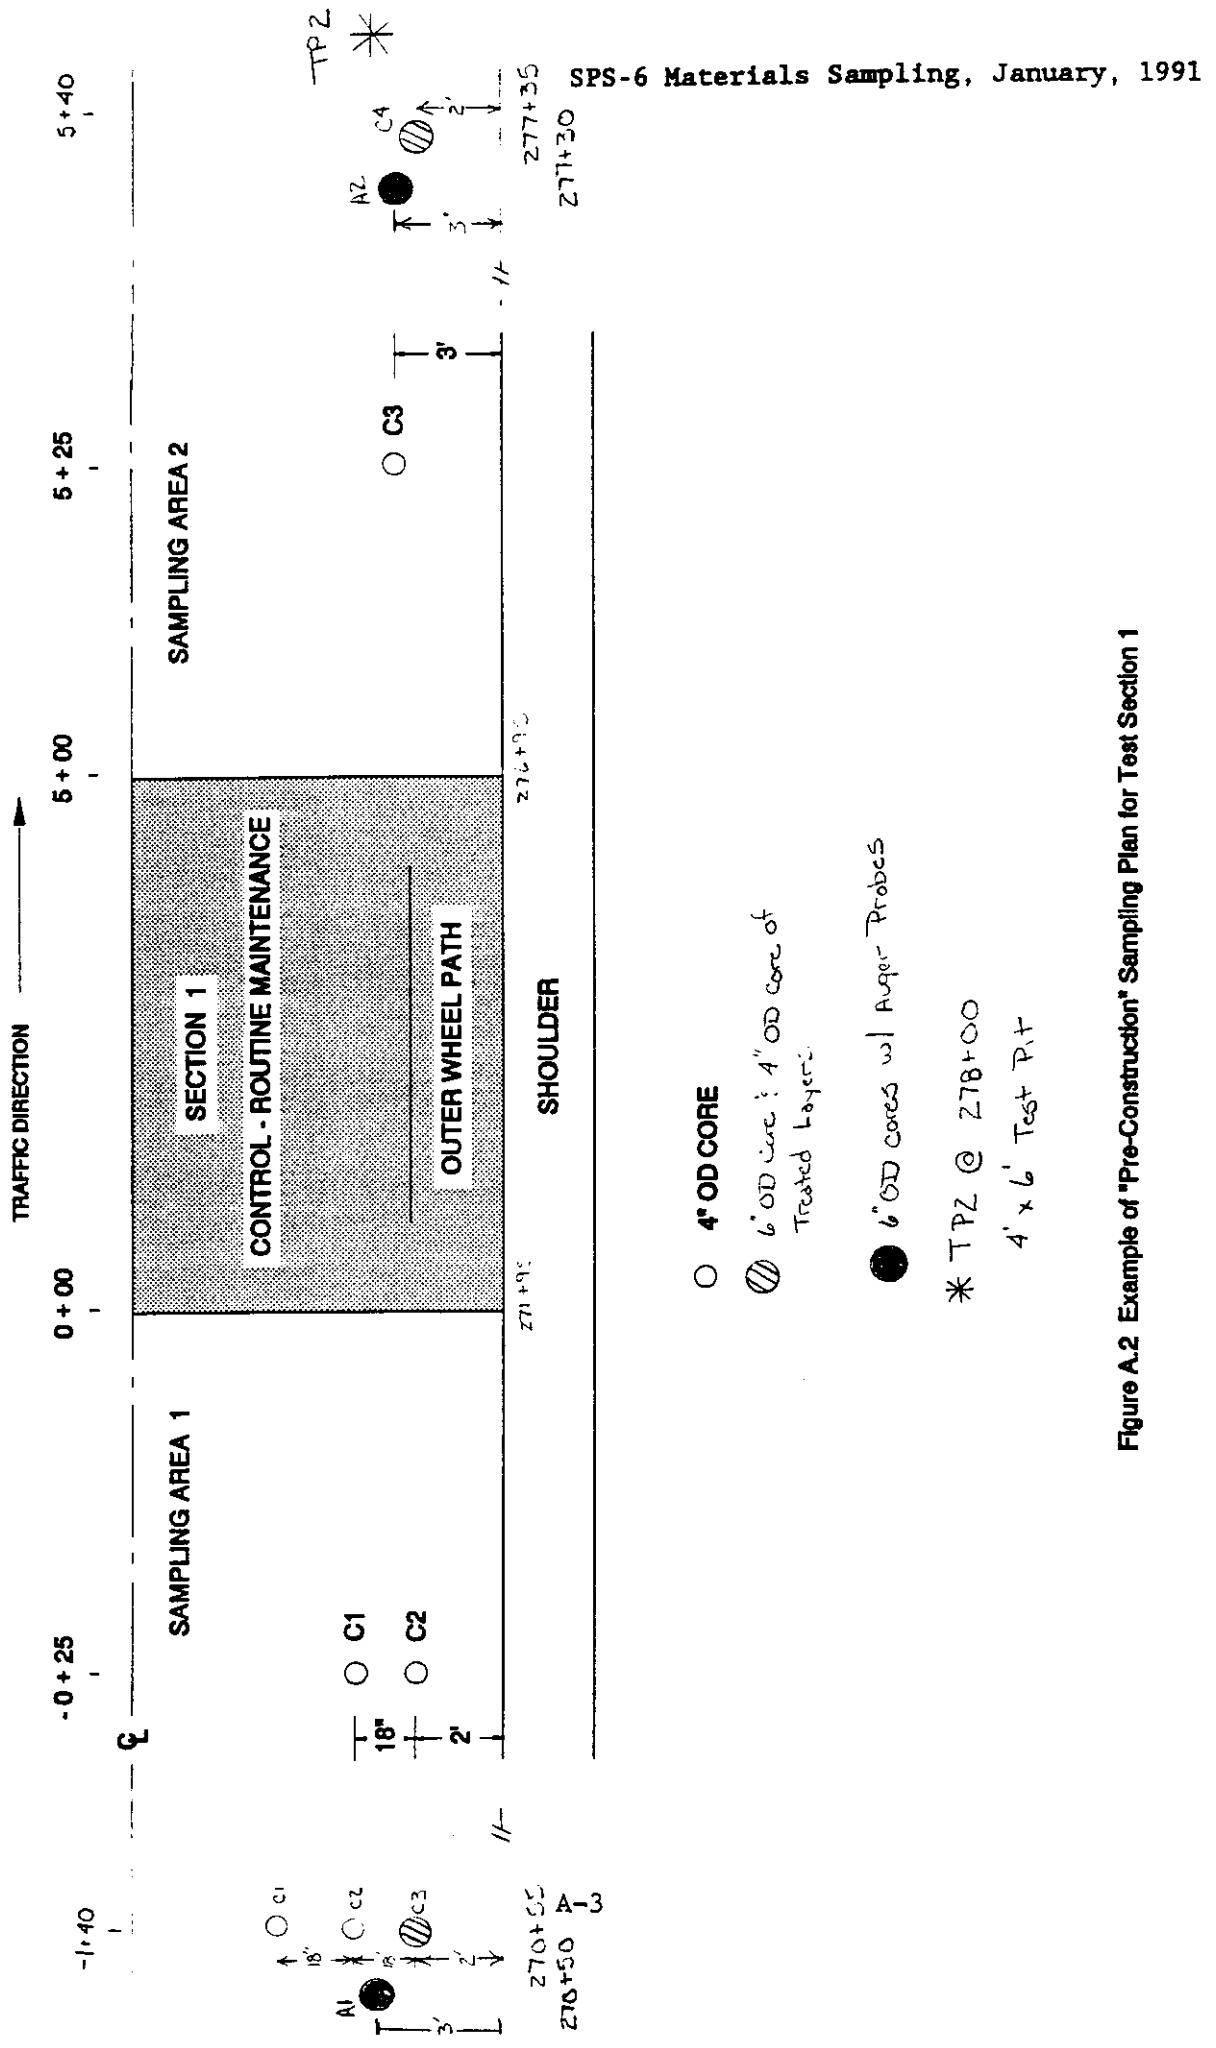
Example of "Pre-Construction" Sampling Plan for Test Section 1
